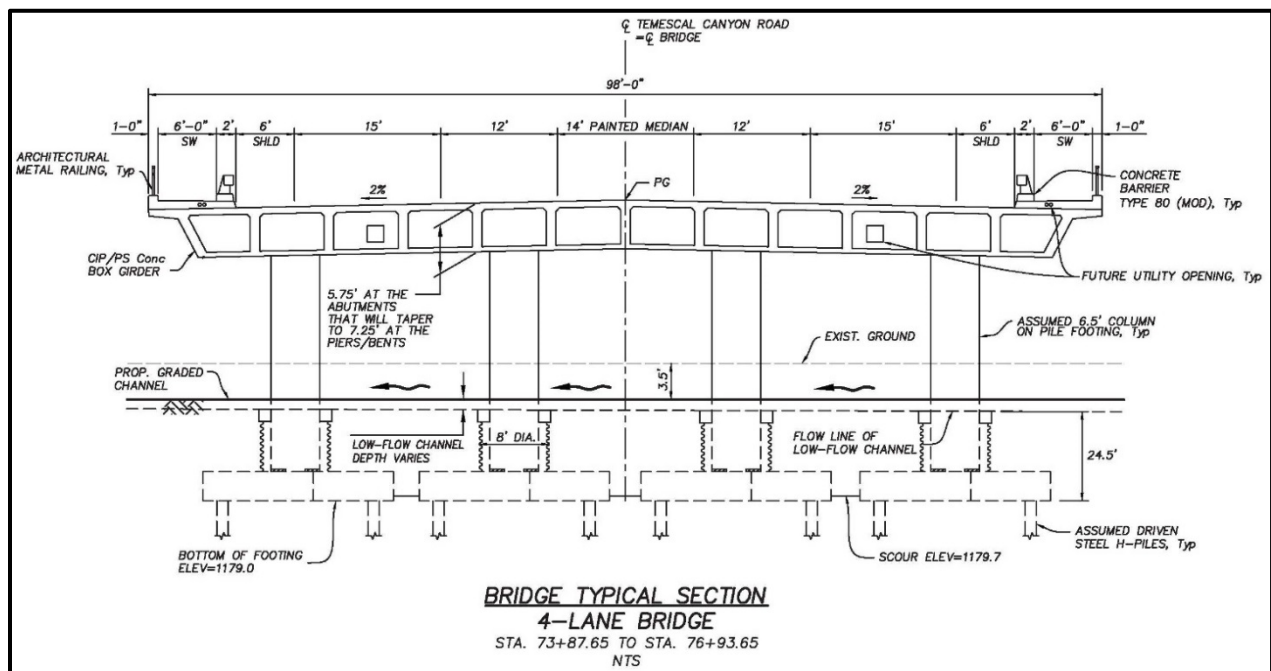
Typical Section of Proposed Temescal Canyon Road Bridge
